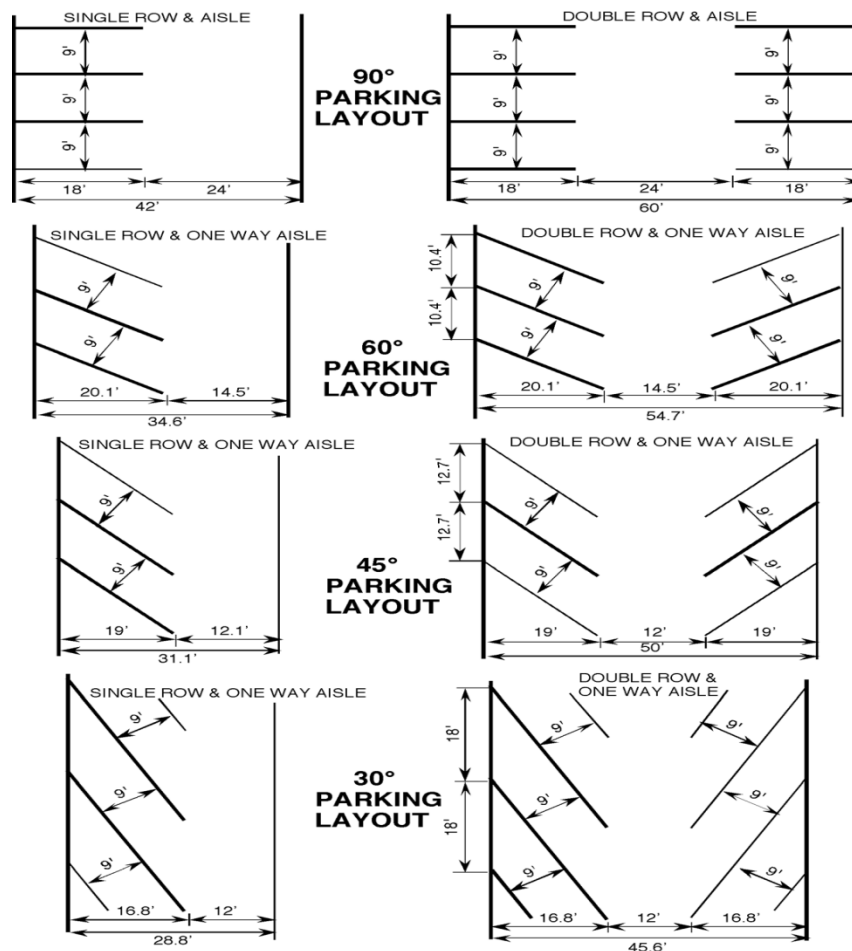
90°, 60°, 45°, 30° parking layouts
